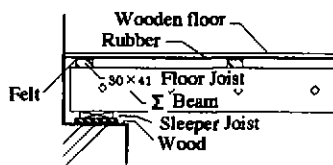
Detail of floor structure (Cond#1 &amp; 2)
